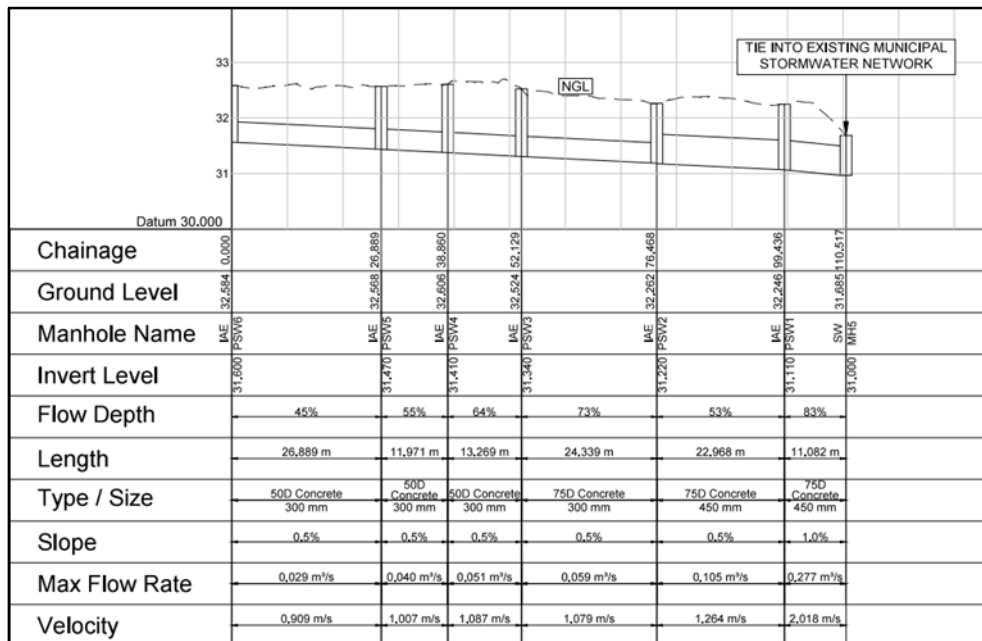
Long section of proposed new stormwater infrastructure between IAE PSW6 and SW MH5
